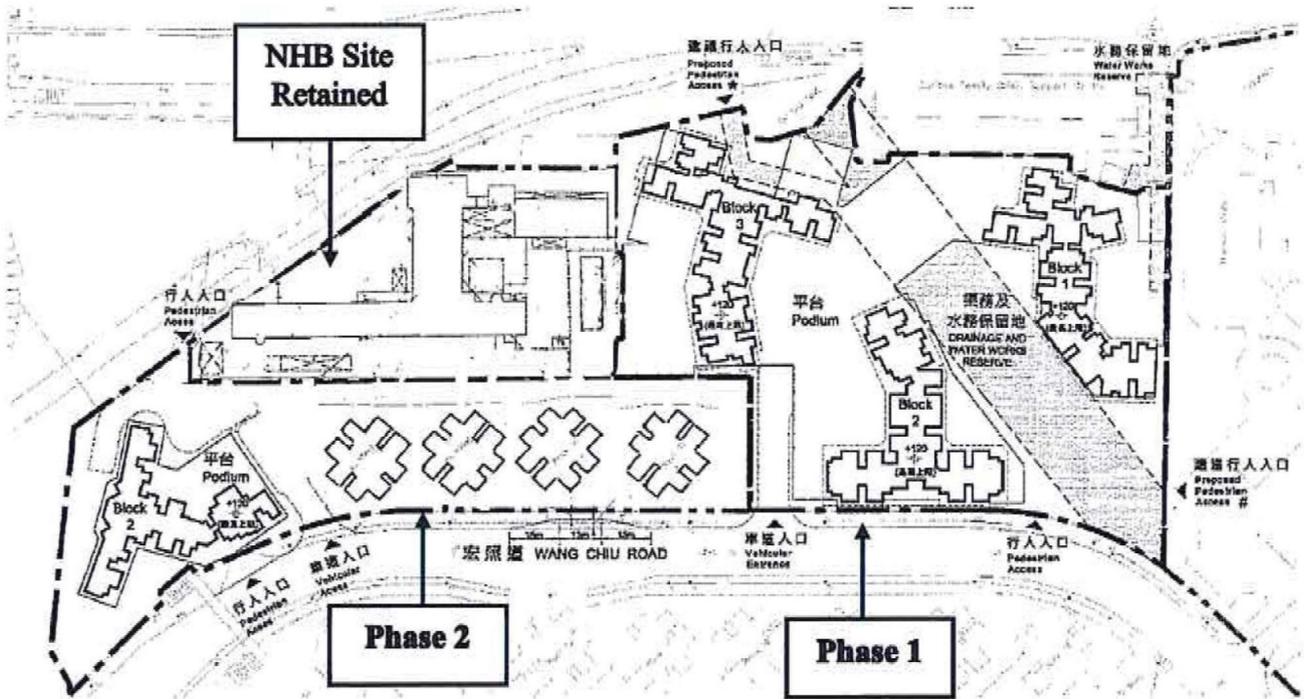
Indicative Layout Plan of the Preferred Option for WCR Site
